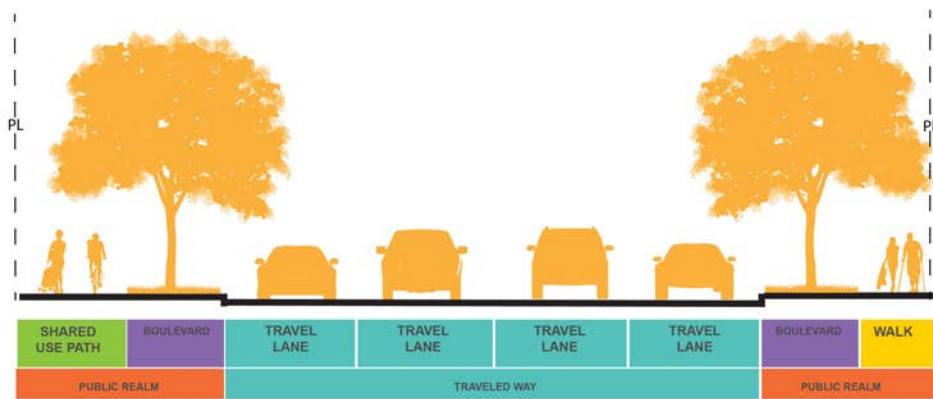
Long-term future 50 Street cross section with existing drainage swale replaced by urban style curb and gutter system and additional boulevard tree plantings.
